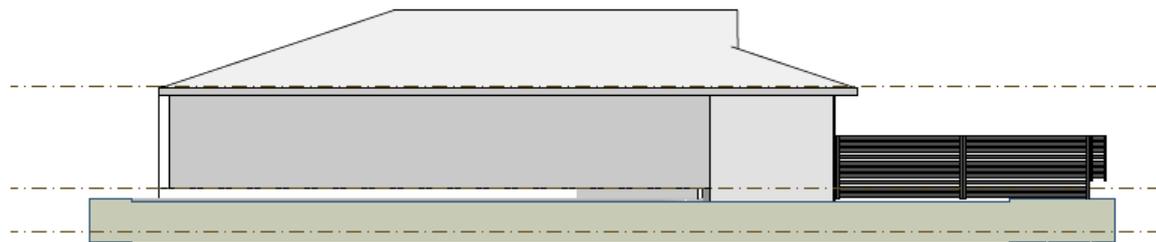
Original Elevations Proposal Under DA.2020.1109 (prepared by Tru-Line Design)
